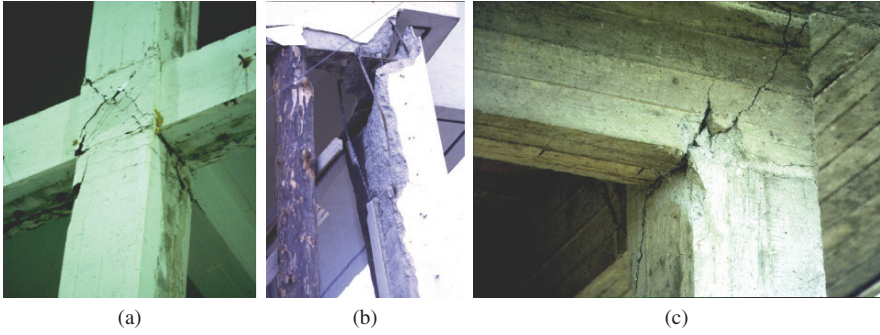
Shear failure of exterior joints. (a) reinforced joint; (b), (c): unreinforced joints (See also Figure 3.47 on page 288)
